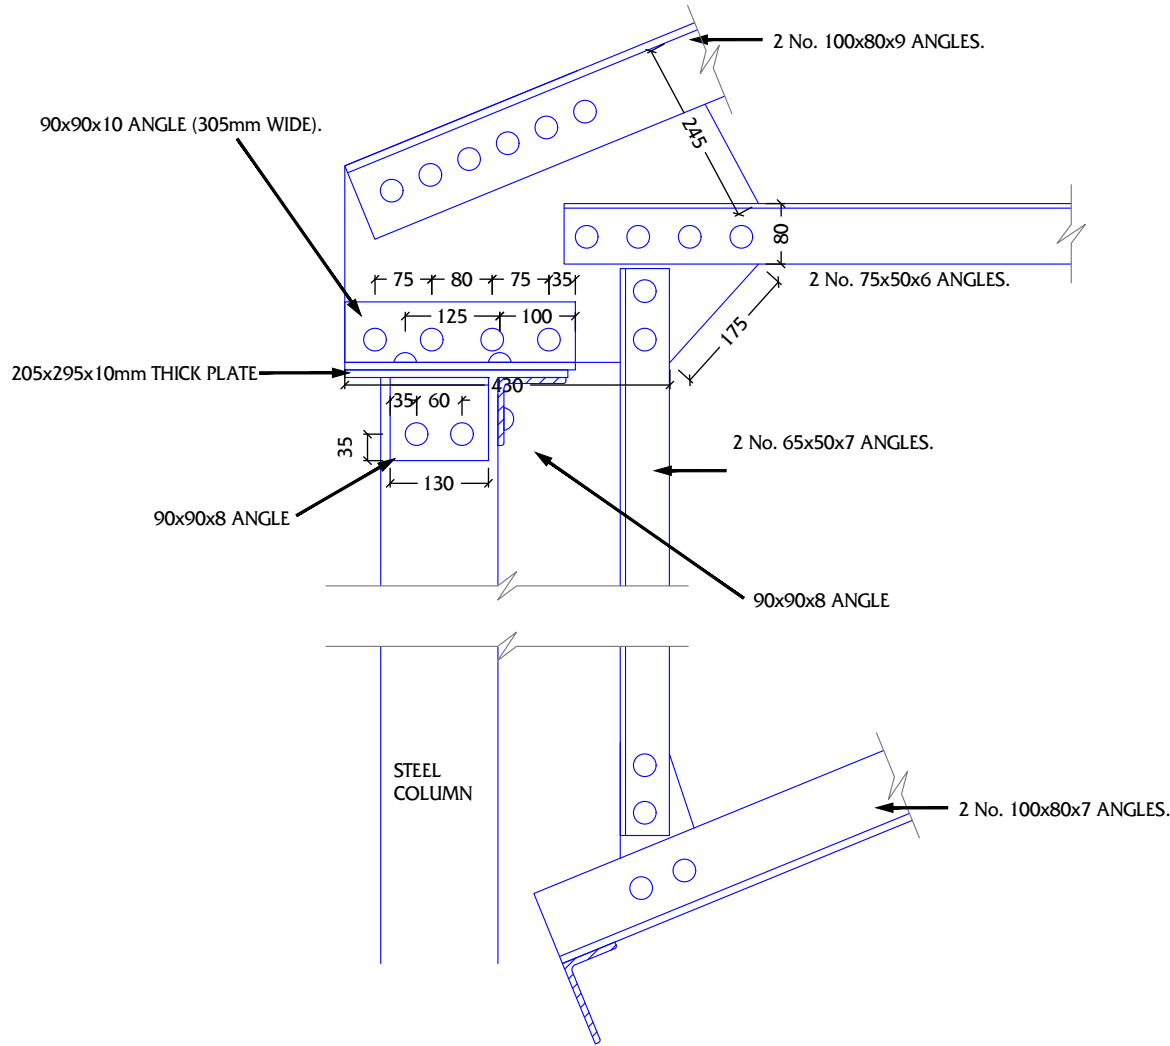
PART ELEVATION LOOKING SOUTH SHOWING DETAILS OF PARTIALLY EXPOSED ROOF TRUSS END CONNECTION - SURVEY AREA H10 SCALE 1:10
